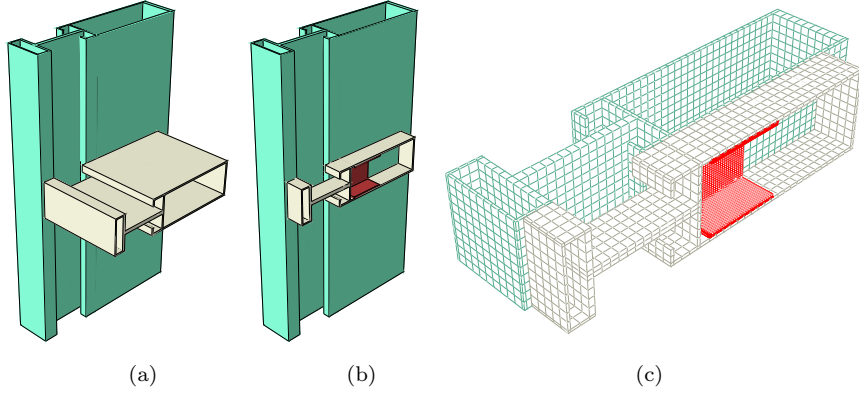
Façade B - Transom-to-mullion connection (a-b) and U-joint mesh (c).
